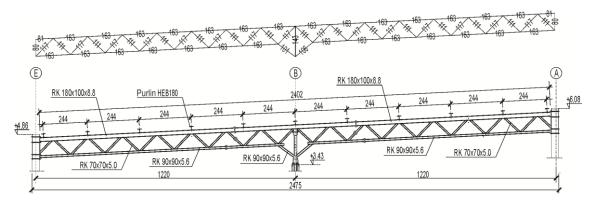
Indirect girder in the construction based on steel profiles. Dimensions [cm] *Source: Own study.
